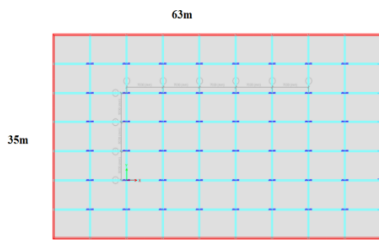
a Building plan (T3.1,3.2,3.3,3.4)
